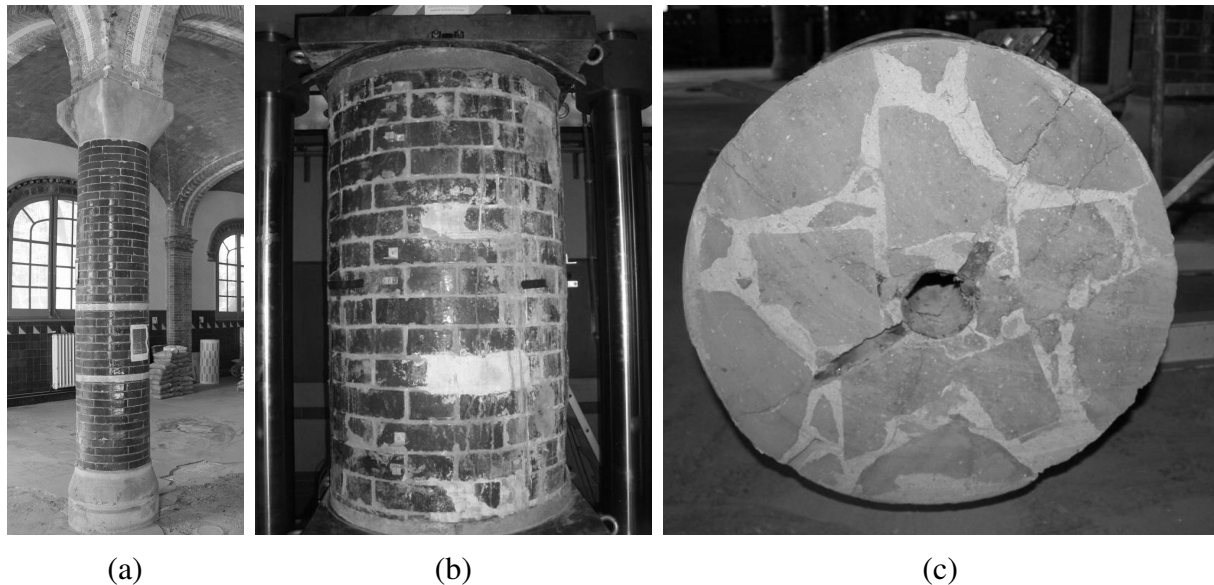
(a) Image of structural layout of pillars, (b) its external and (c) its cross sectional geometry.
